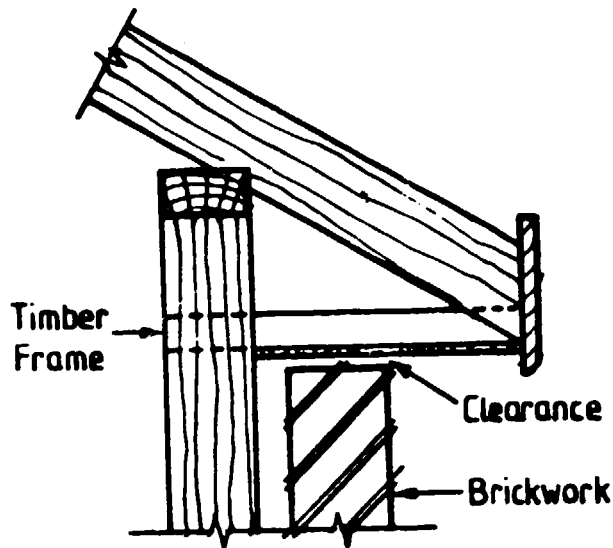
Provision of clearance between the soffit lining and brickwork in brick veneer construction
